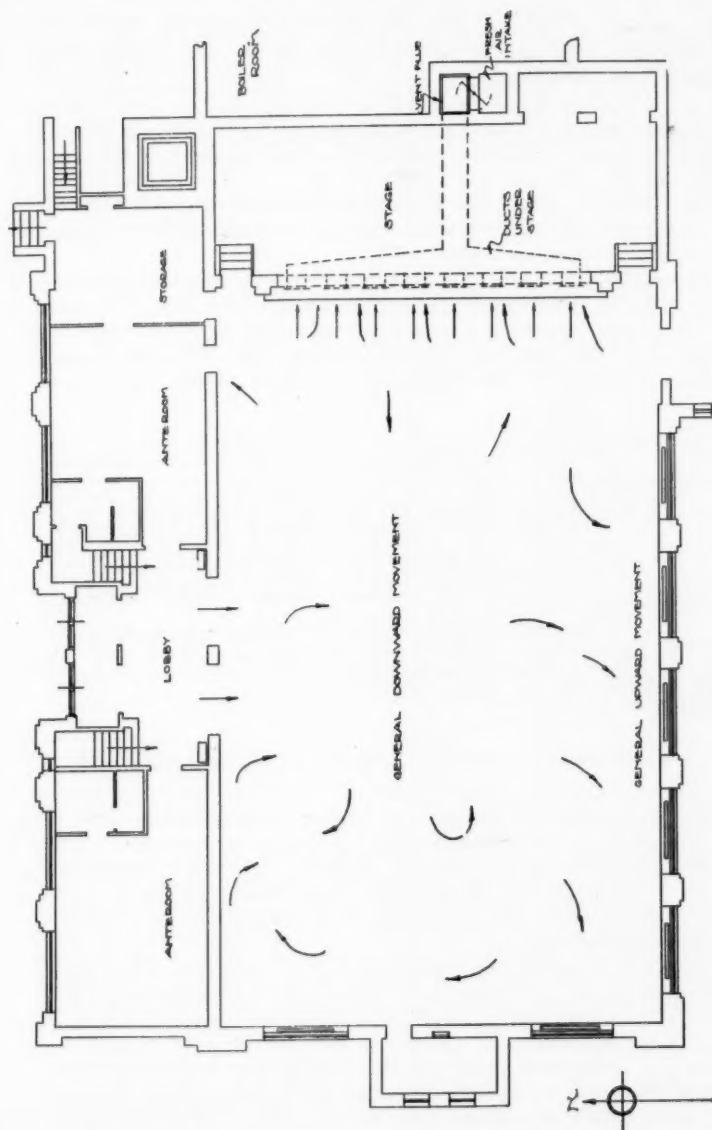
FIRST FLOOR PLAN OF AUDITORIUM
